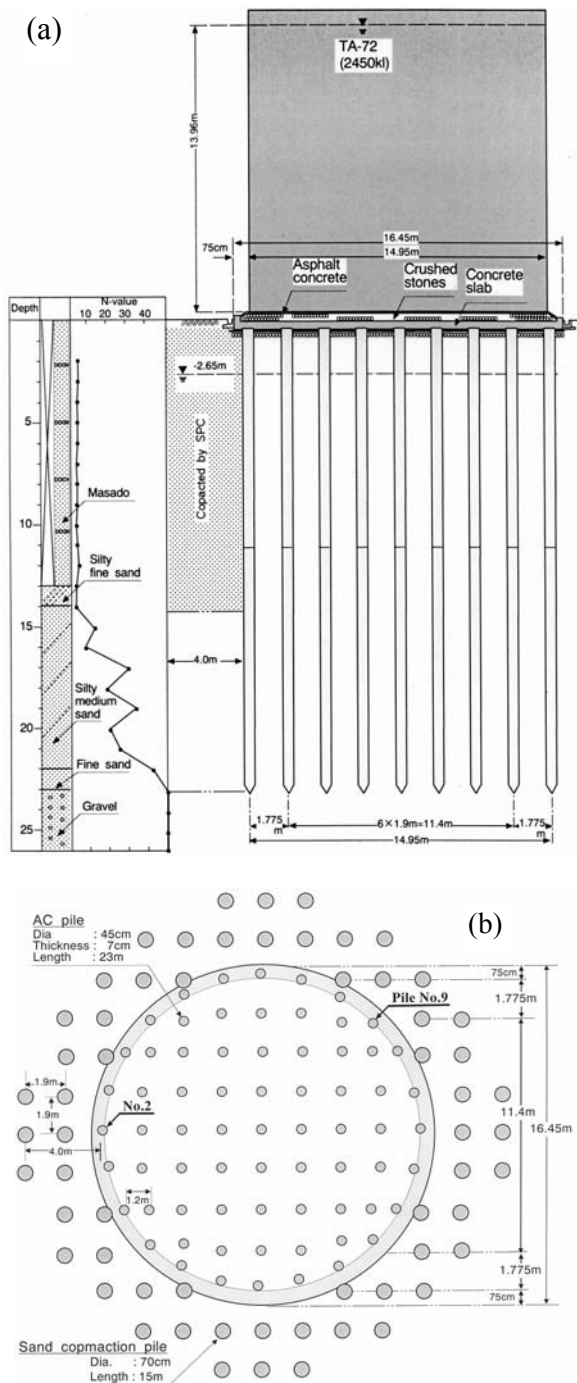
Mikagehama Tank TA72: (a) cross-sectional view; (b) plan view of foundation elements
